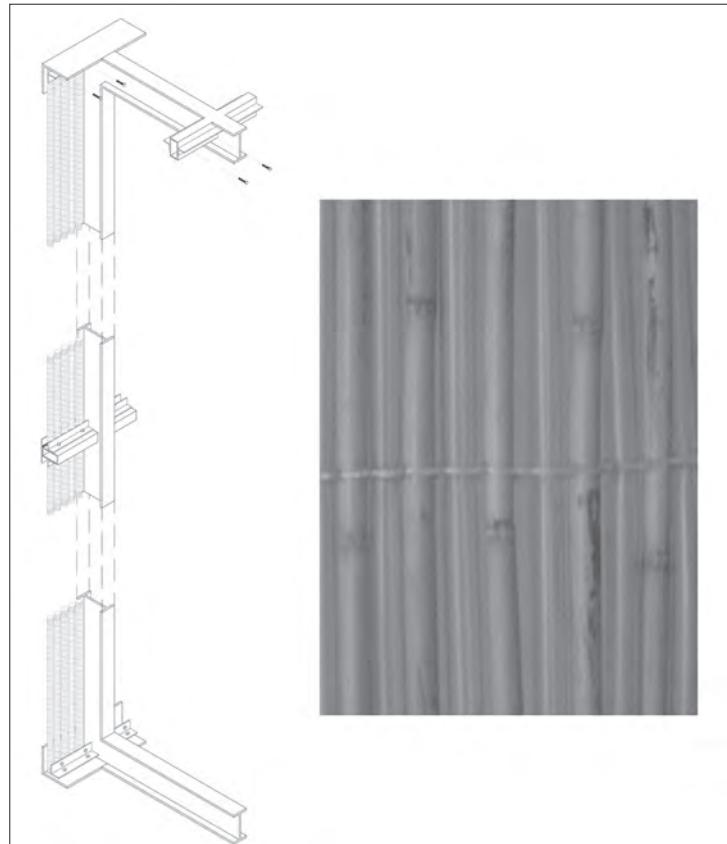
Olive-Oil Press, exploded axonometric showing how the bamboo skin is attached to the structure, and a detailed photo of the bamboo skin.
